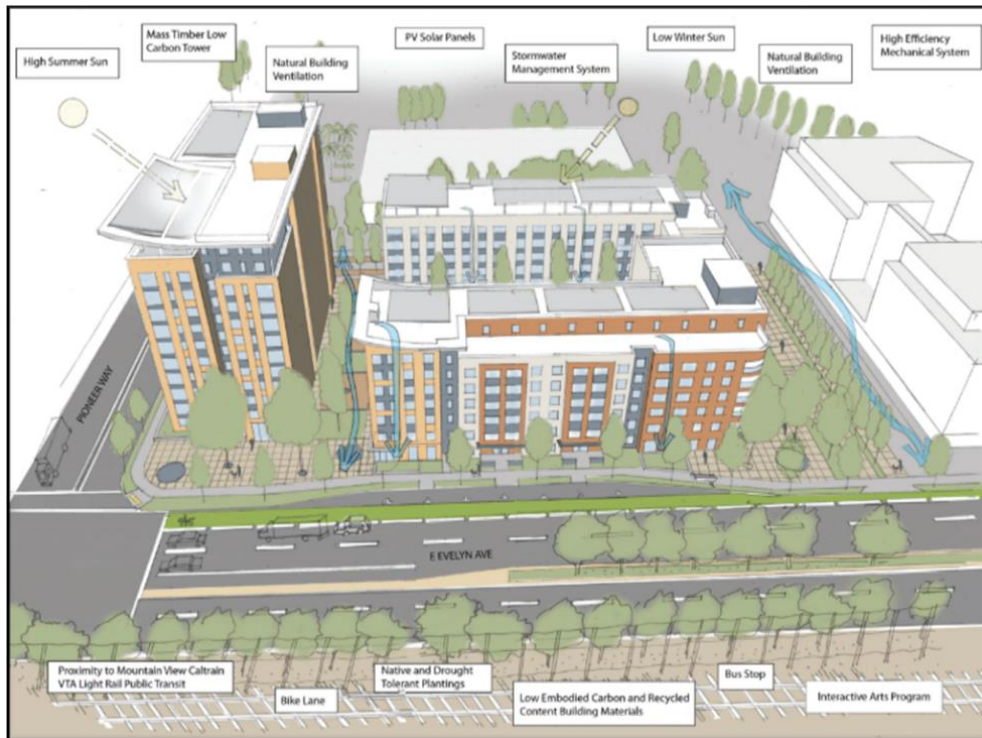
Affirmed Housing Proposal—Design and Sustainability Plan
